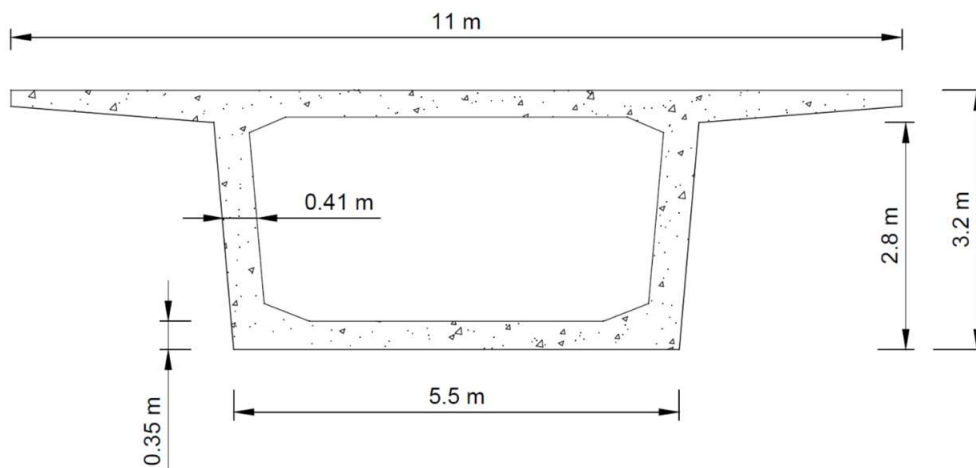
Cross-section of the concrete bridge deck at Ensenada do Engano (dimensions in m)
